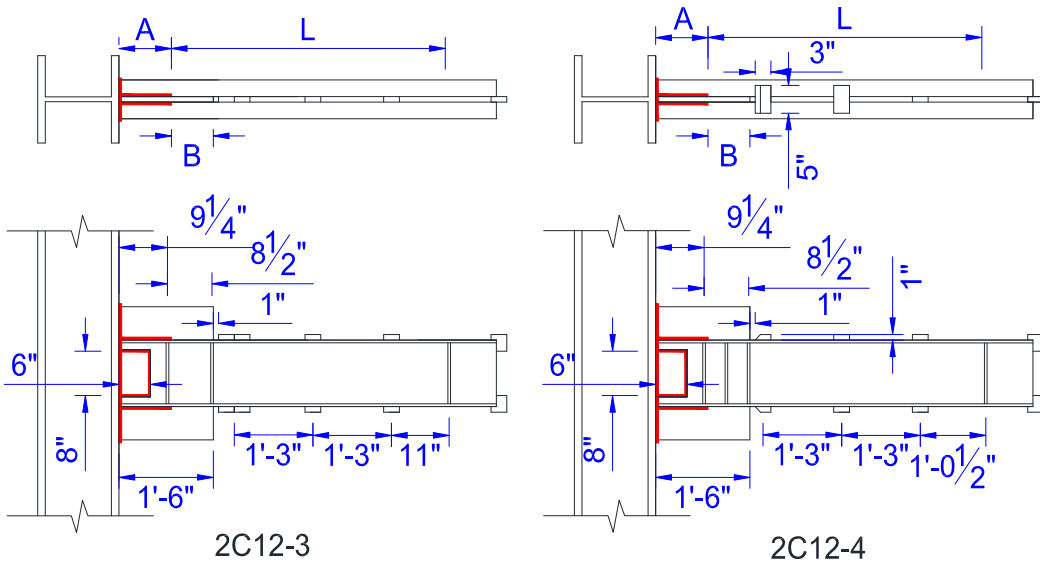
Dimensional Details of Specimens 2C12-3 and 2C12-4
